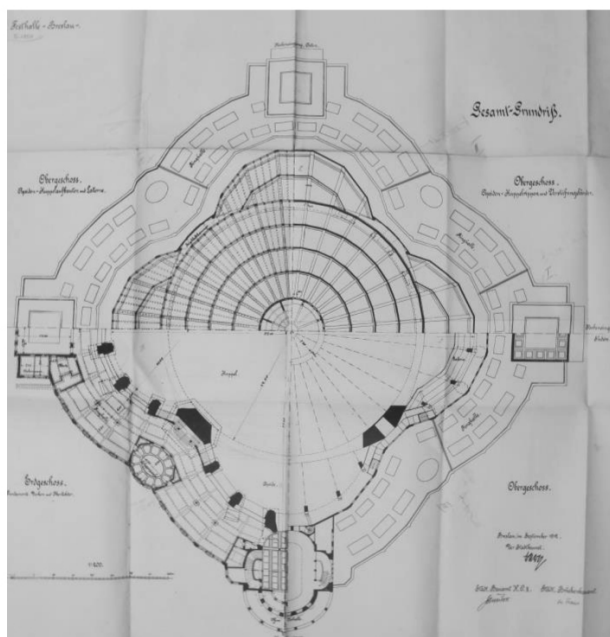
Locations (marked in red) where dilatations were planned to be introduced due to cracks which appeared on the external walls of the Hall.
